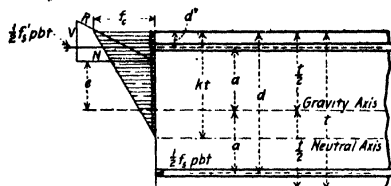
Stresses caused by a force producing compression and tension upon a reinforced section, tensile strength of concrete neglected.
